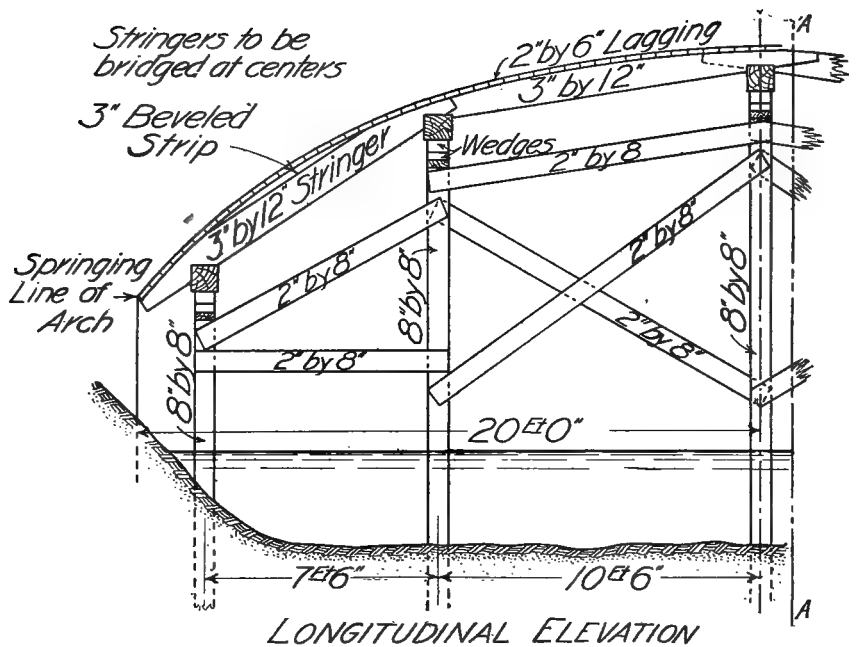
FALSEWORK AND CENTERING FOR ARCH WITH SPAN OF 40 FEET.
